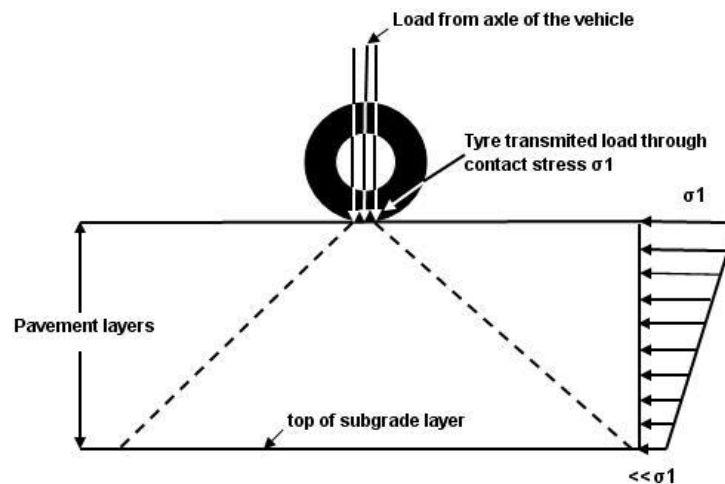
Load distributions on flexible pavement (Source [1])
